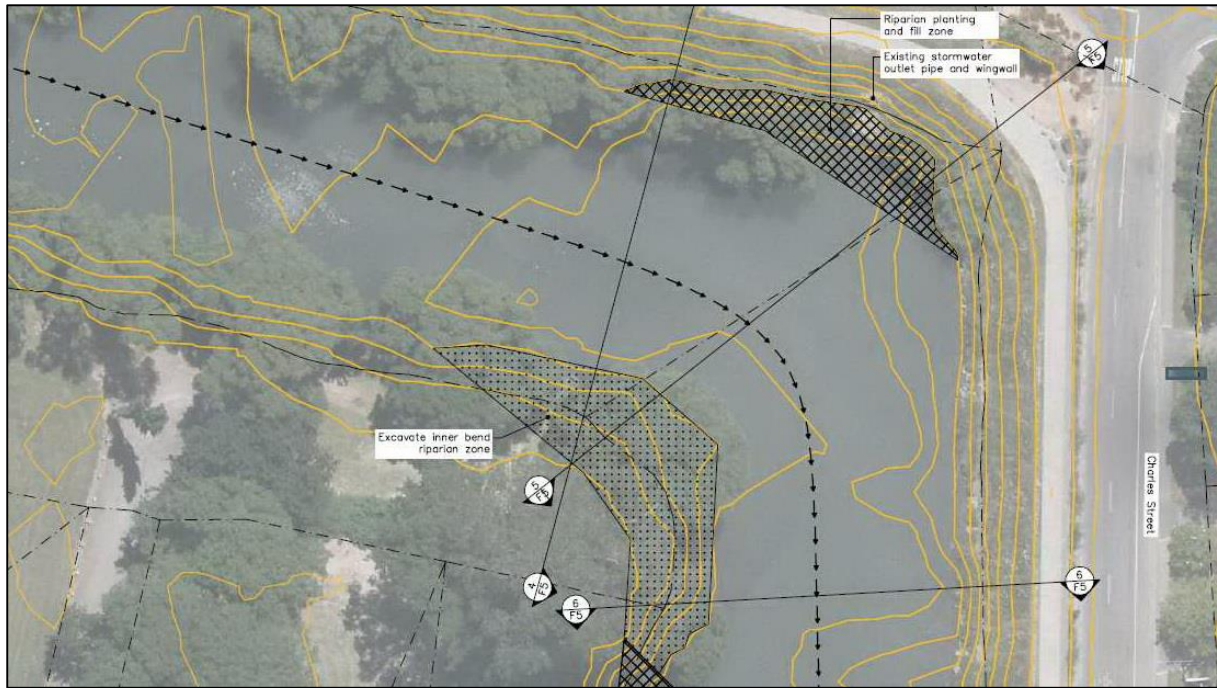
Elbow bend drainage outfall wetland and bank re-profiling (from Appendix C)
